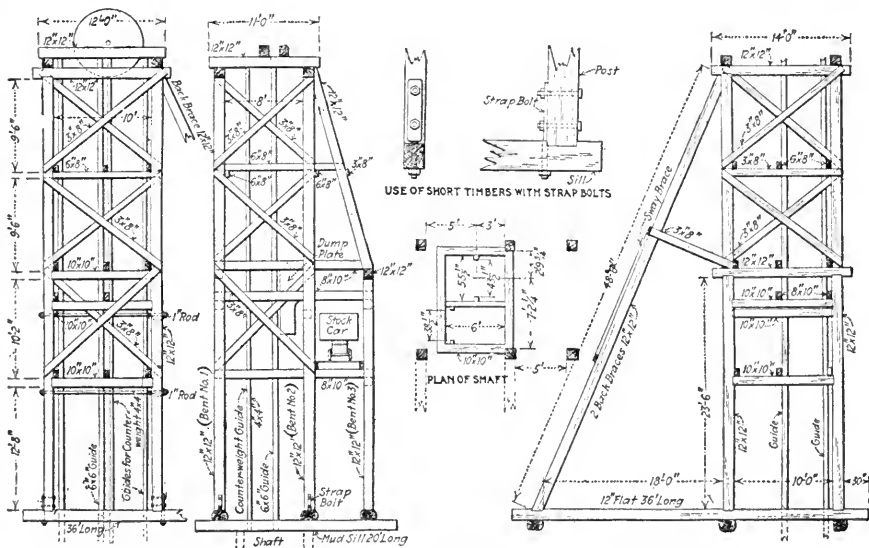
ELEVATION AND DETAILS OF SMALL FOUR-POST TIMBER HEADFRAME.
